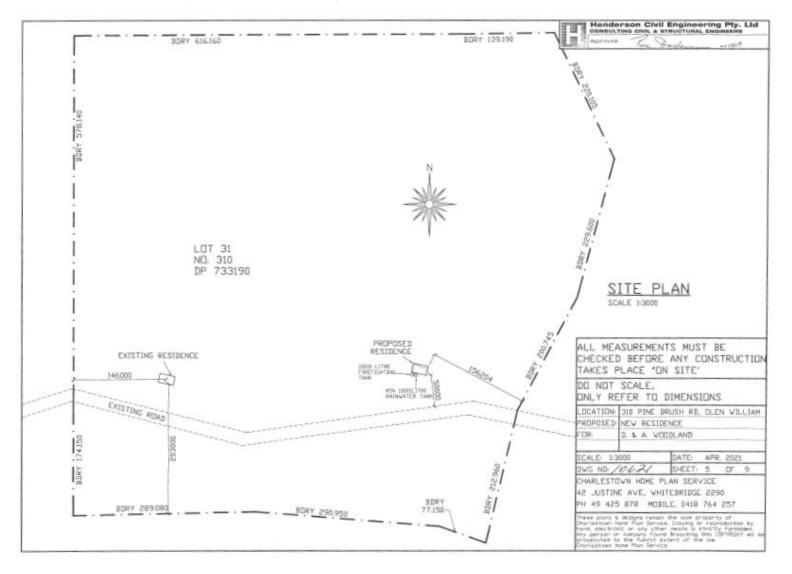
Proposed dwelling (Source: Charlestown Home Plan Service, 2021)
